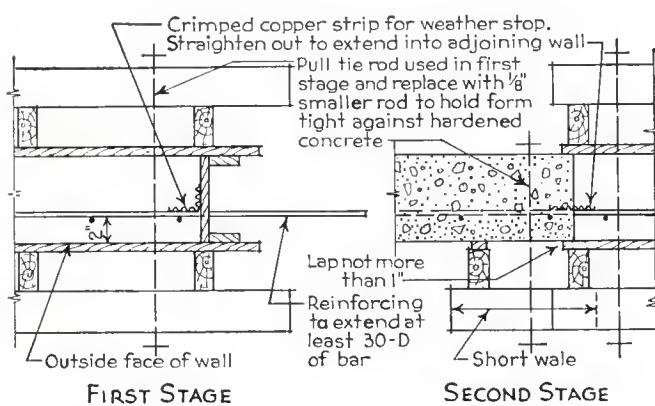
At vertical construction joints means should be provided as shown here to prevent offsetting of the joint and to insure watertightness.
